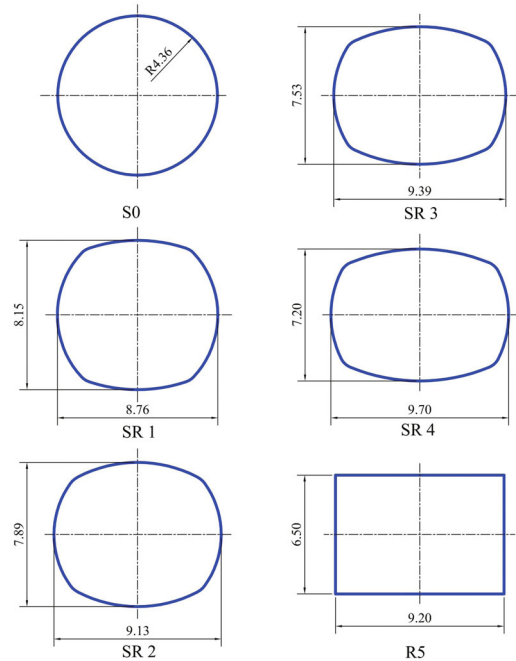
Cross-sections of the tunnel shapes adopted for the study (dimensions in m)
